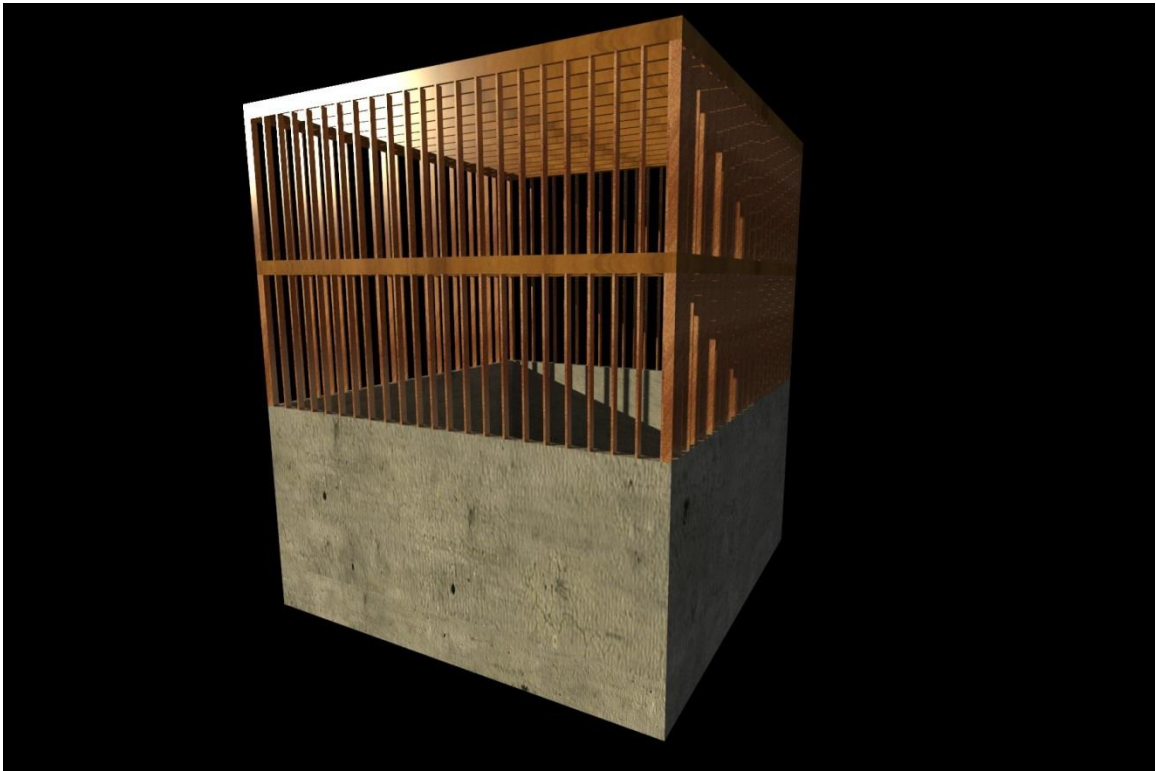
(*Light wood frame construction to assist in controlling float line.*)
